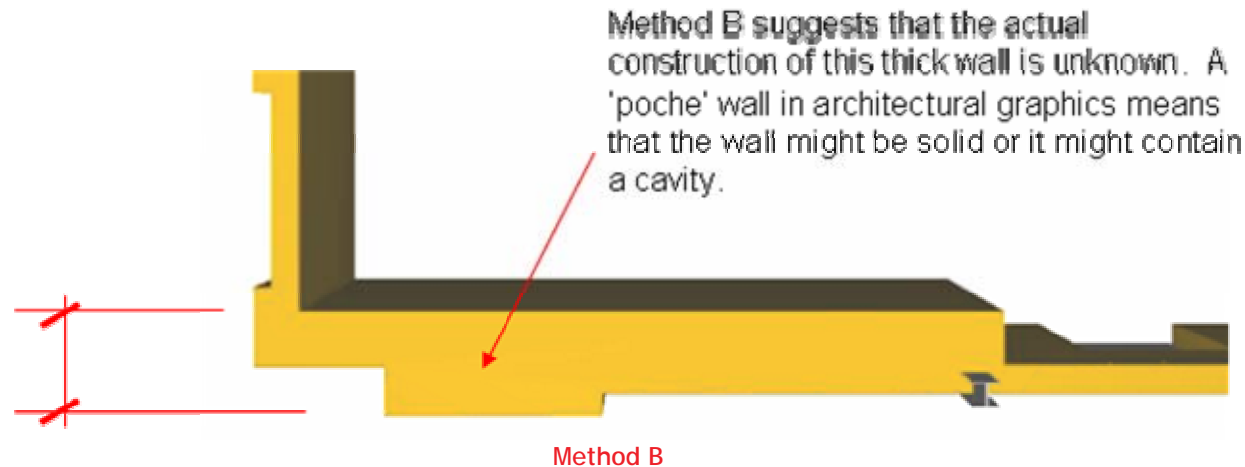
Method B - where wall types are unknown or monolithic (as with concrete)
